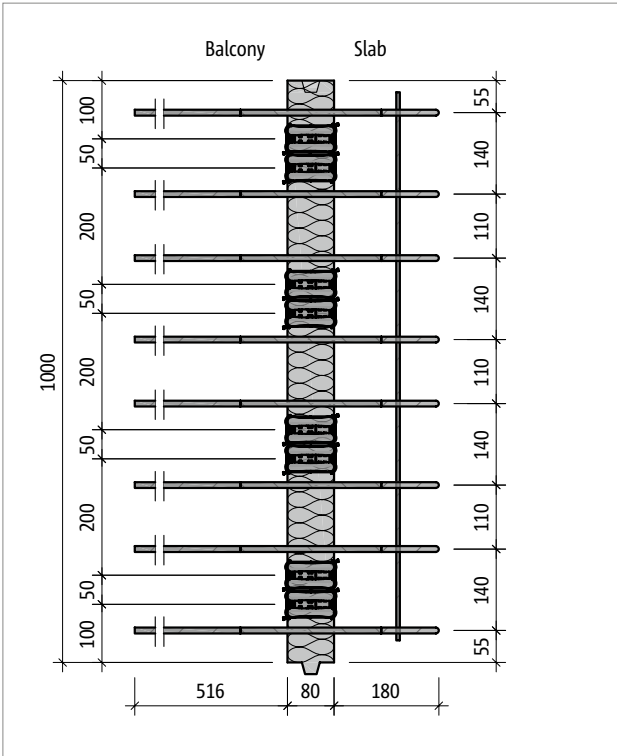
Schöck Isokorb® T type Q-E-W-V5: Product layout
